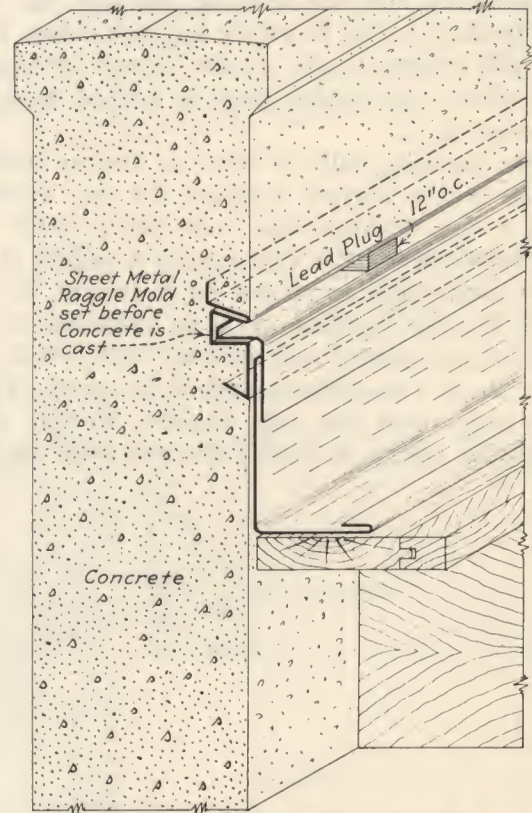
BASE AND CAP FLASHINGS JOINING CONCRETE WALL
